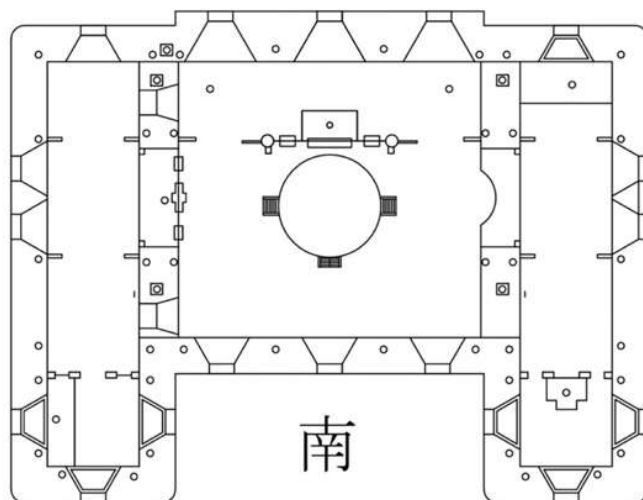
Plan of the Yuanying Guan, (Model Lei, Qing Dynasty) (南, means South). Source: Reconstruction by the author.
